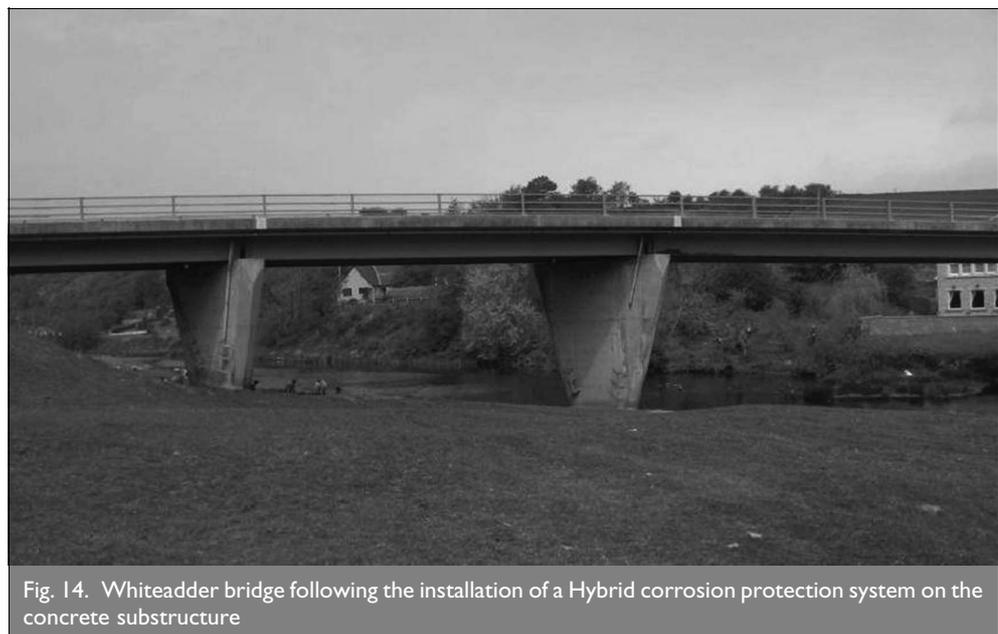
Whiteadder bridge following the installation of a Hybrid corrosion protection system on the concrete substructure
